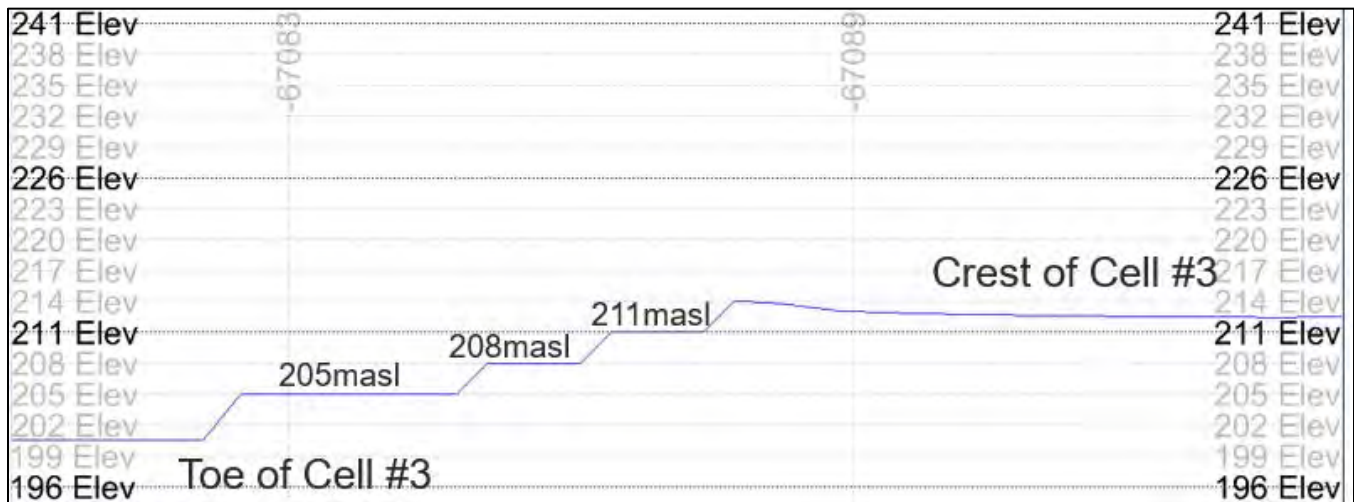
End of Year 5 – Section View of Benches, Looking South
